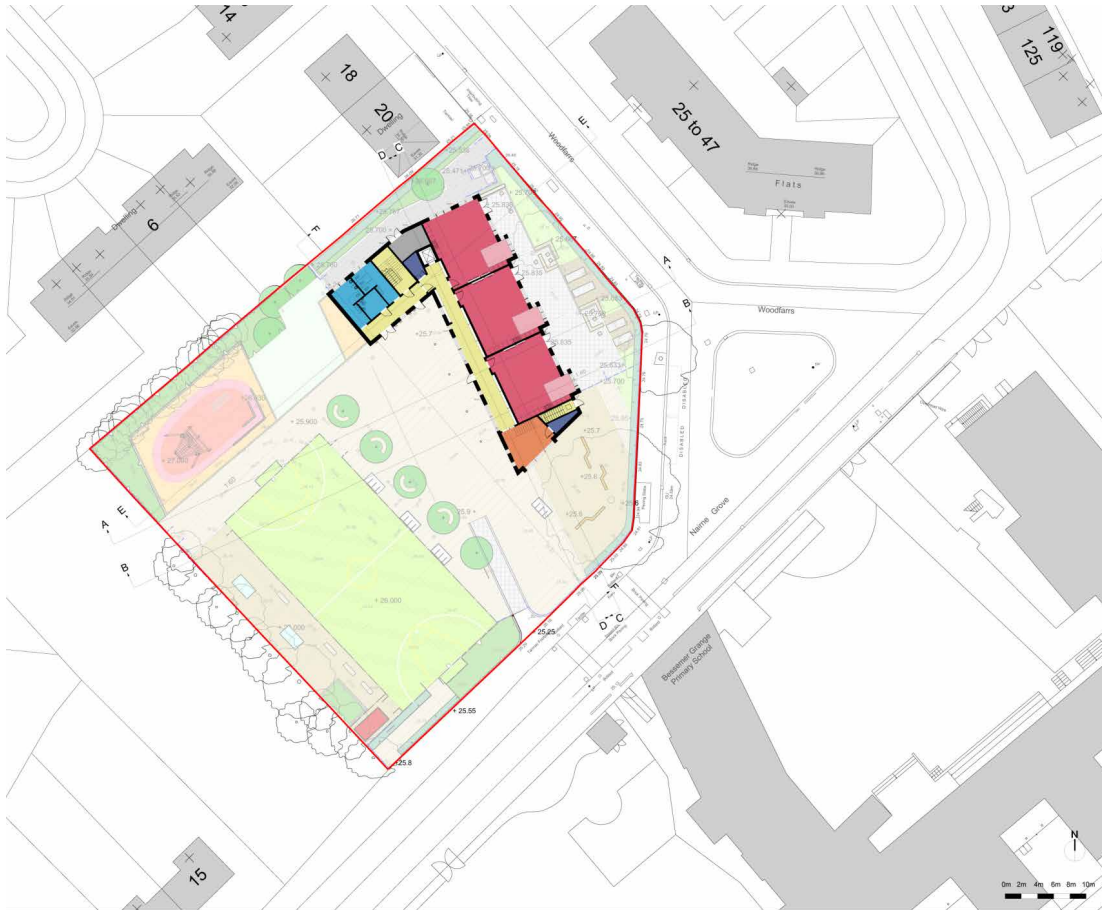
Proposed site plan for new expansion project showing the building positioned relative to the existing buildings (grey).
